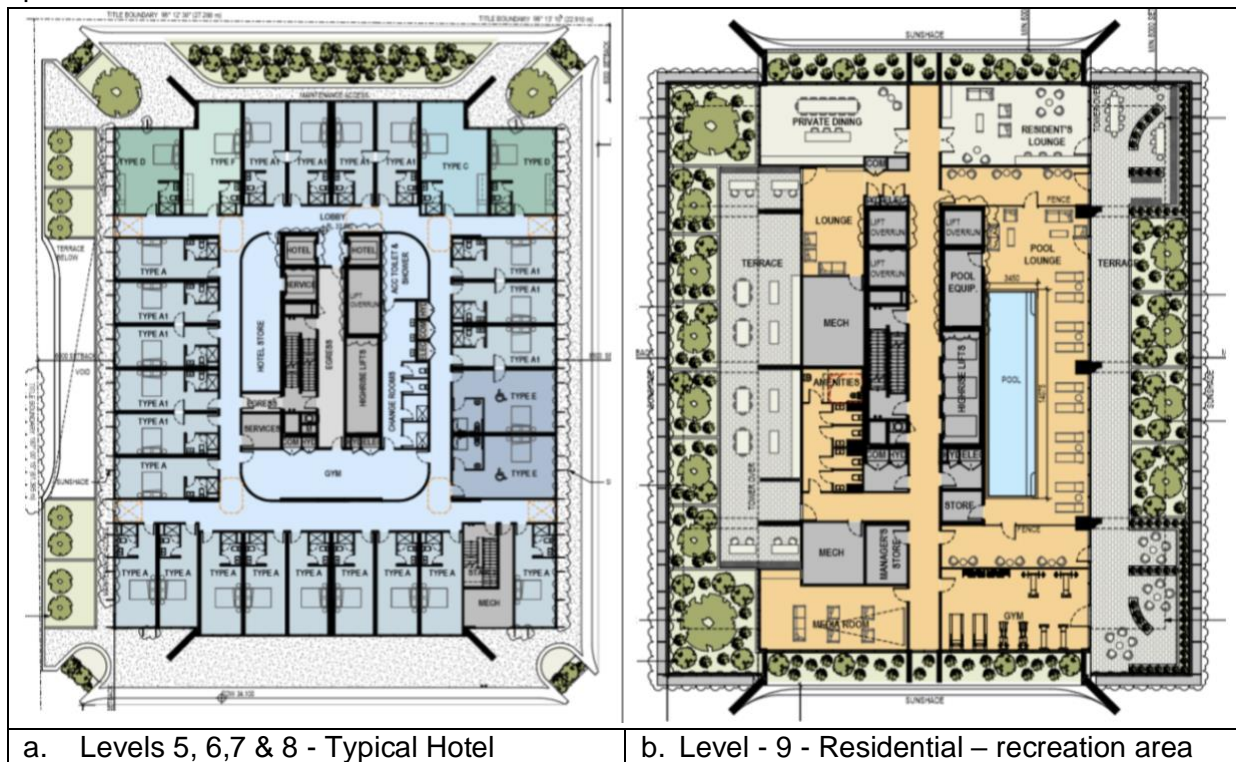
Typical Levels 5,6, 7 & 8 (Hotel) and Level 9 (Residential apartments)
